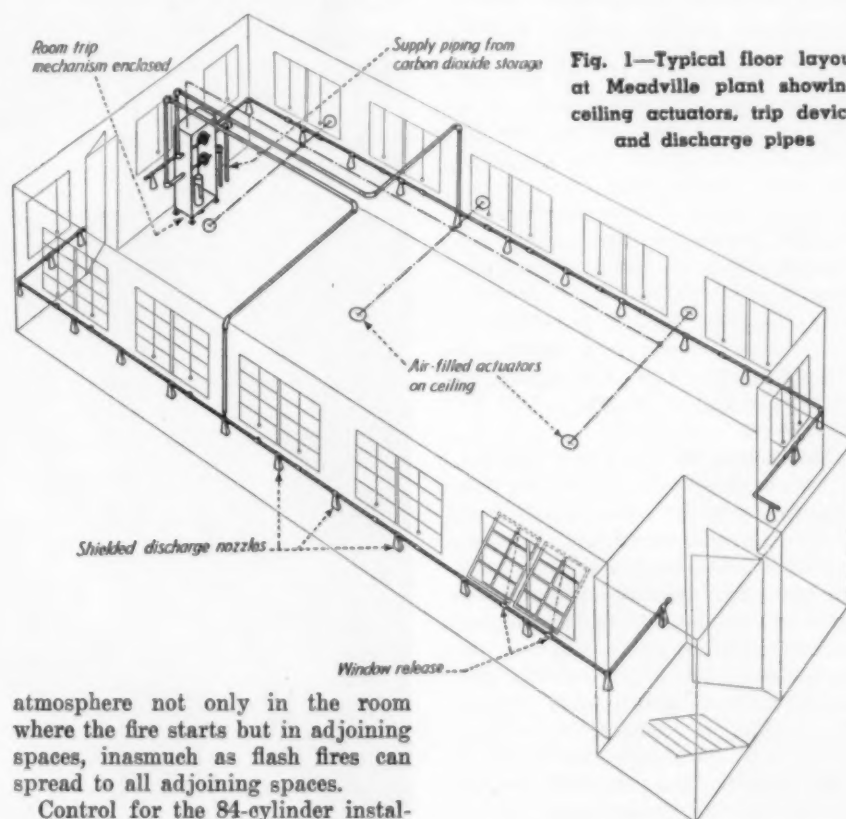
Typical floor layout at Meadville plant showing ceiling actuators, trip device and discharge pipes
